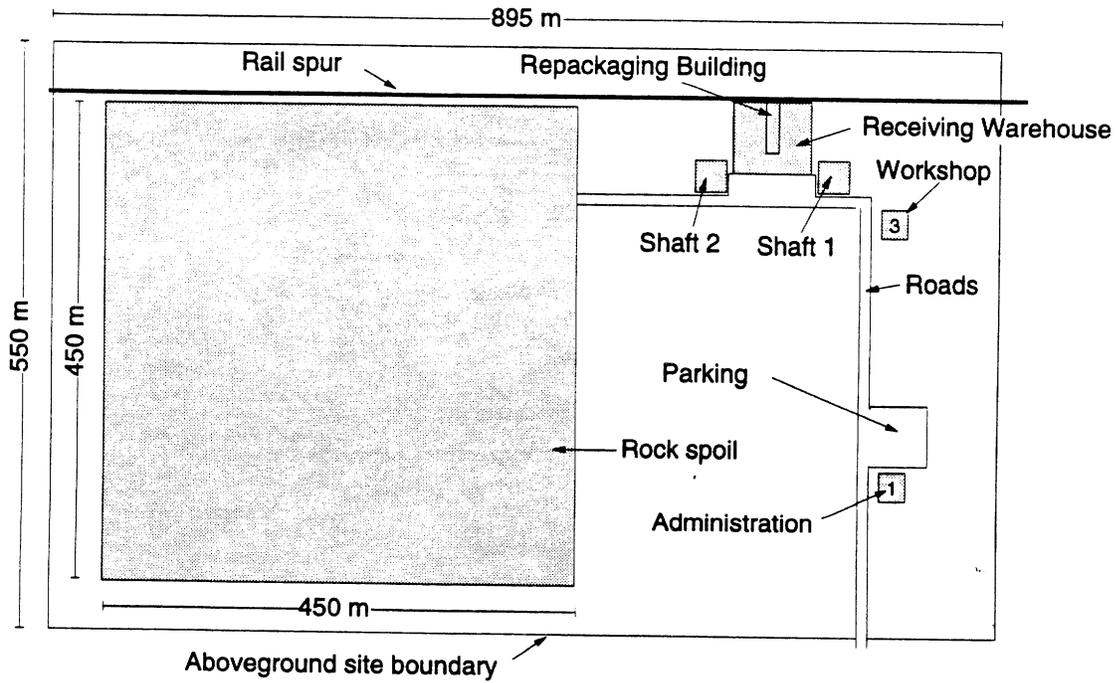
Aboveground Site Layout, UO₂, Mined-Cavity Storage Facility
